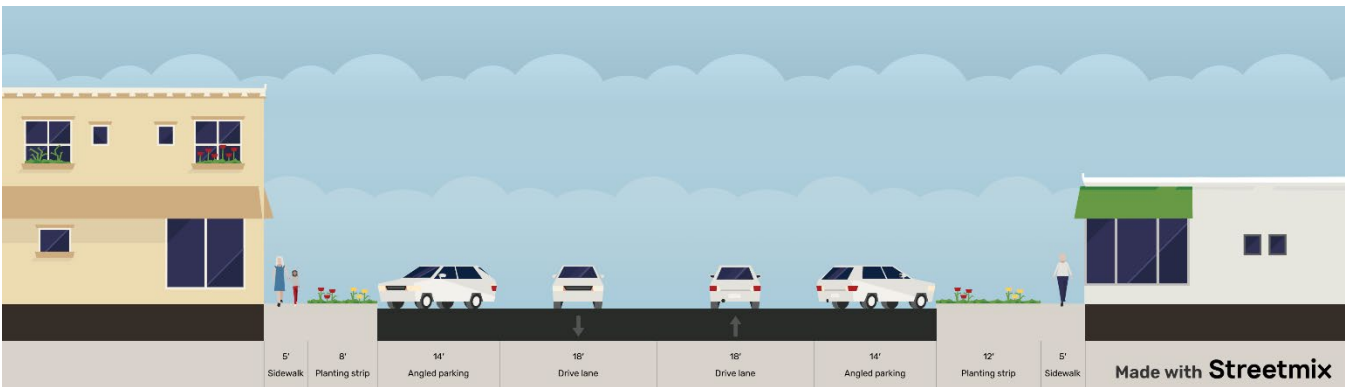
EXISTING MAIN STREET CROSS SECTION
